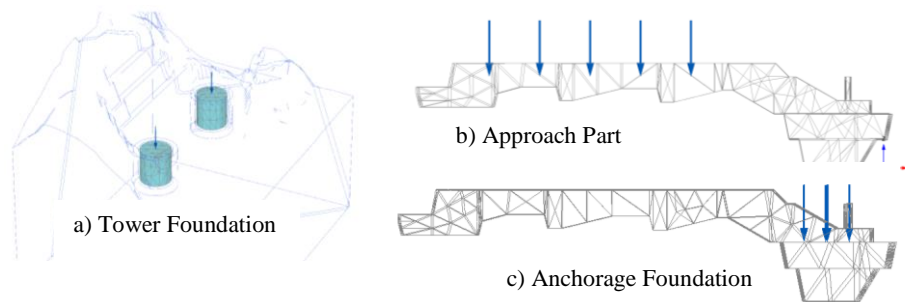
Illustration of Bridge Foundation and Locations of Force/Moment Applications: a) Tower; b) Approach Part; c) Anchorage.
